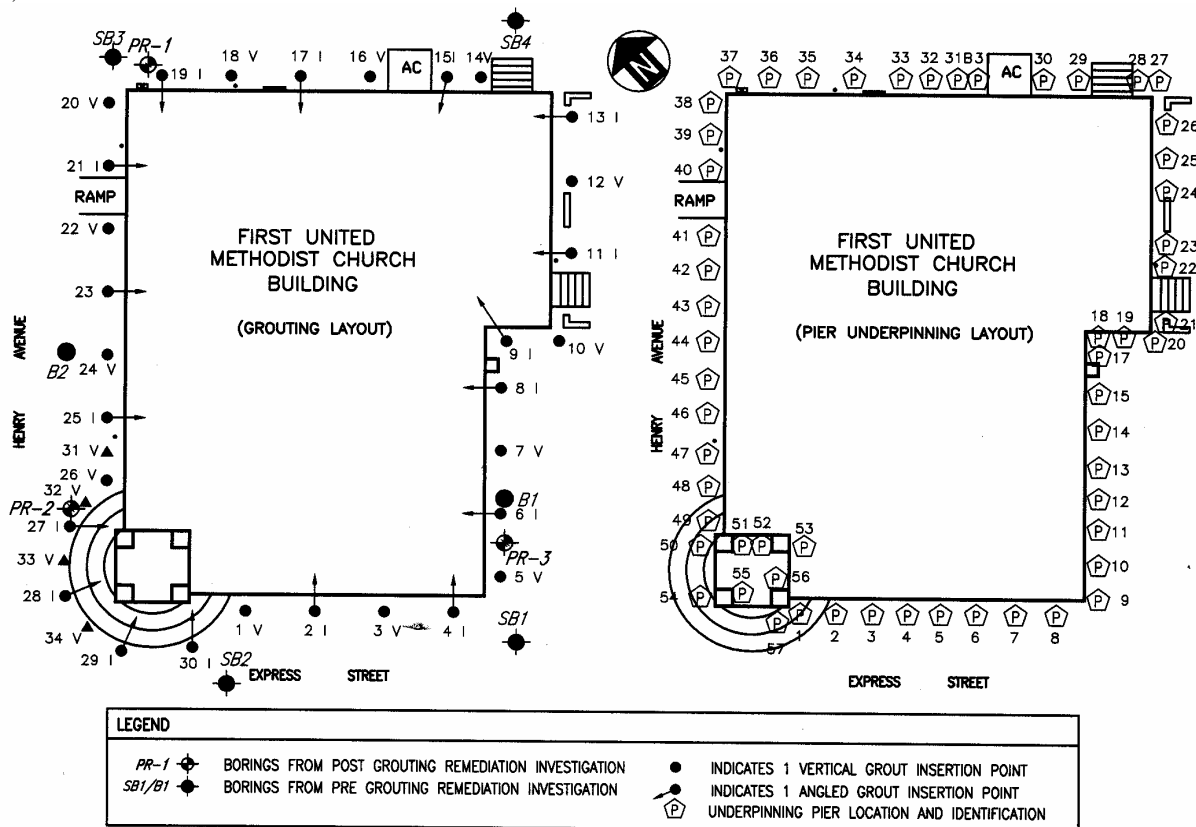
Plan showing grouting points, underpinning piers, pre- and post-grouting test boring locations
